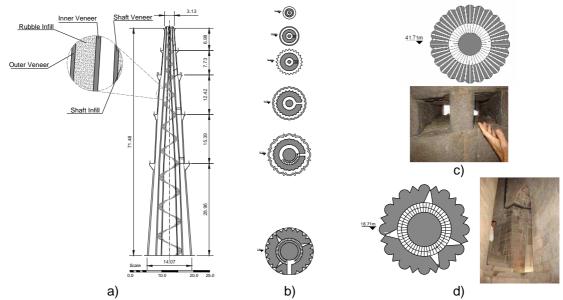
Geometrical survey: a) vertical section of the minaret; b) cross sections at different levels; c) small size ventilation openings; d) tapered windows.
